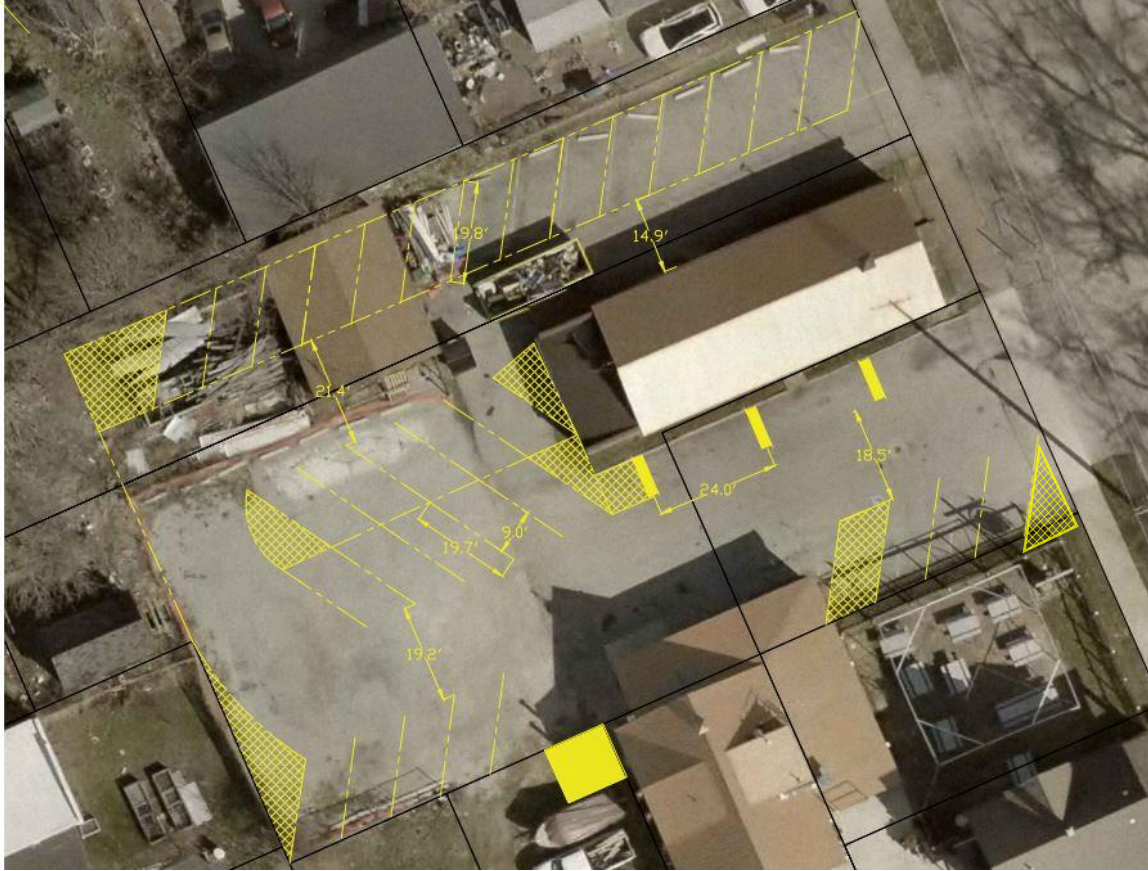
DETAILS ADDED SINCE 2/8/22 INTERNAL PRELIMINARY REVIEW MEETING
